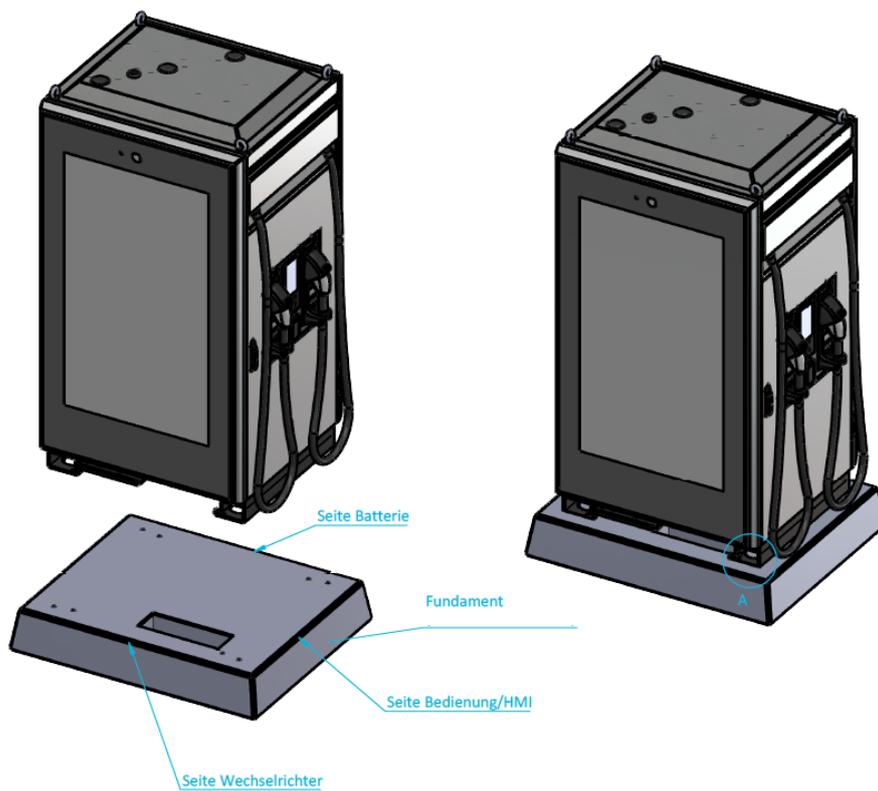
PLANNING THE FOUNDATION/FLOOR SPACE FOR THE OVERALL SYSTEM (DETAIL FROM THE CONSTRUCTION DRAWING)
